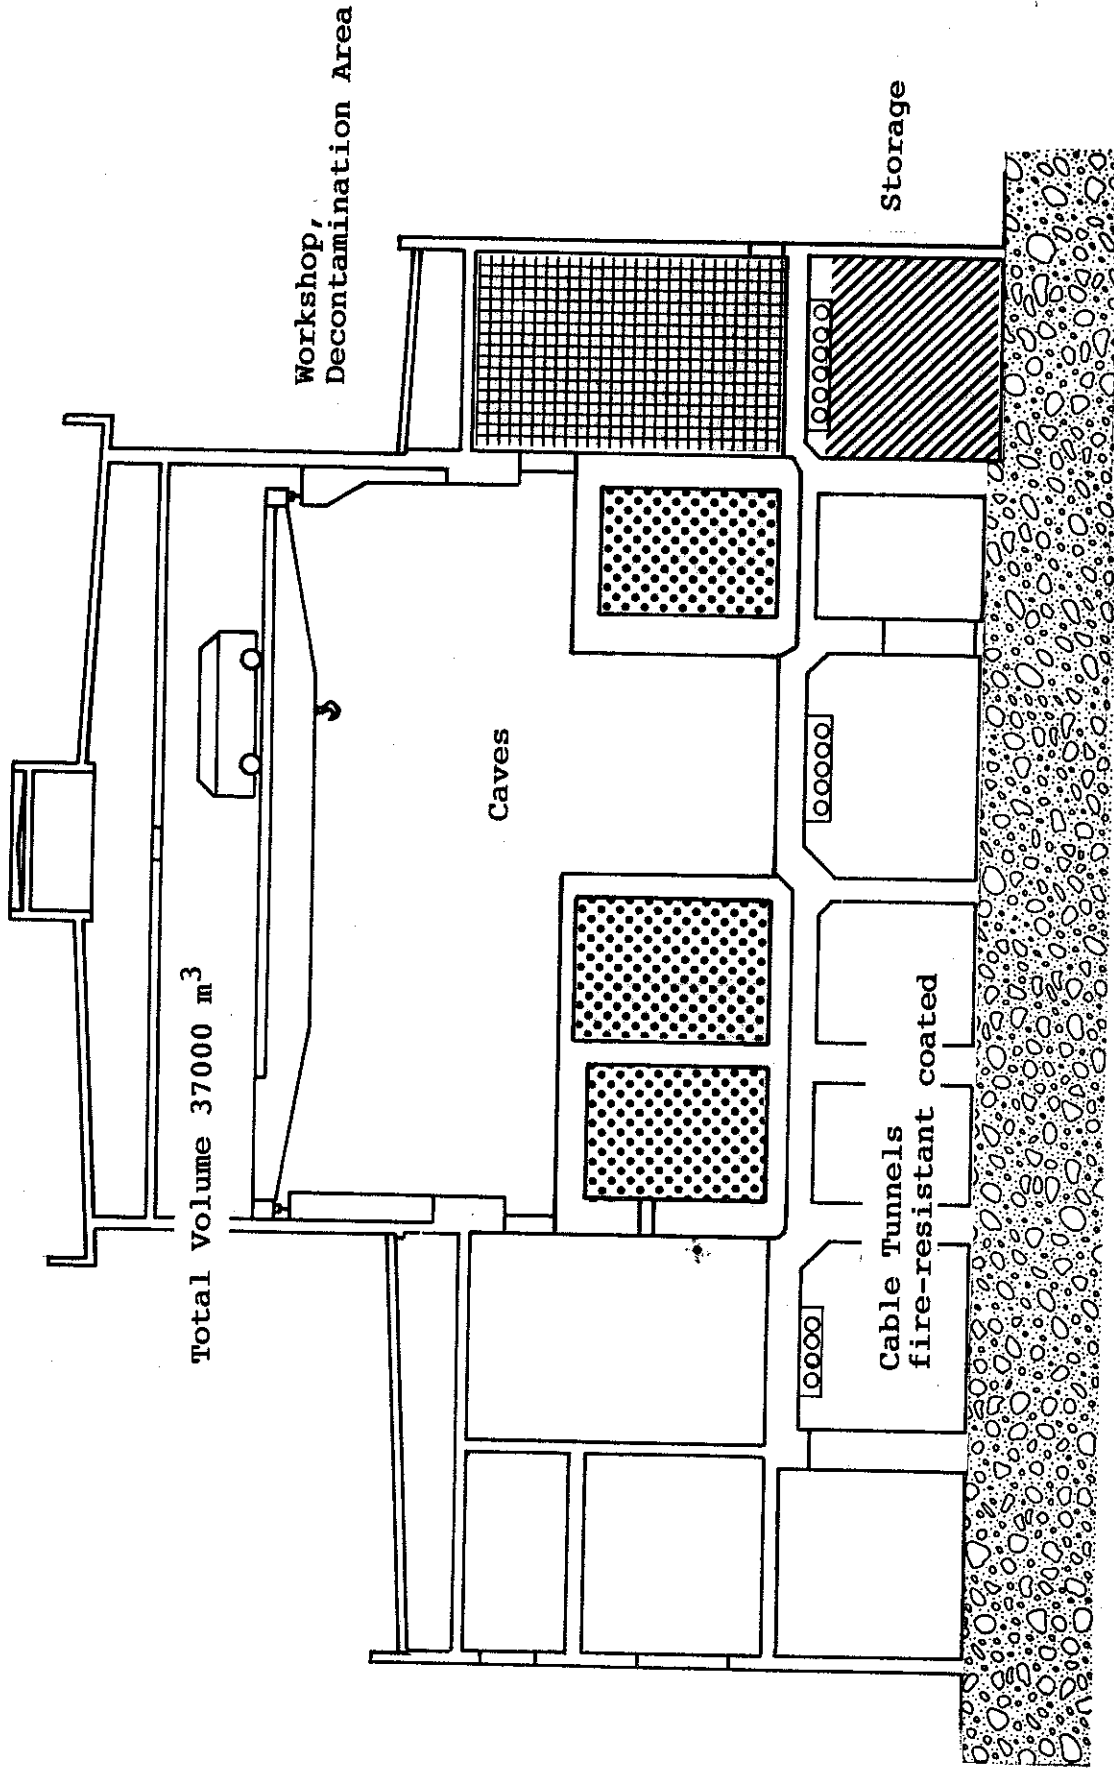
KFA Hot Cell Laboratory (GHZ) C Building Sectional Drawing
